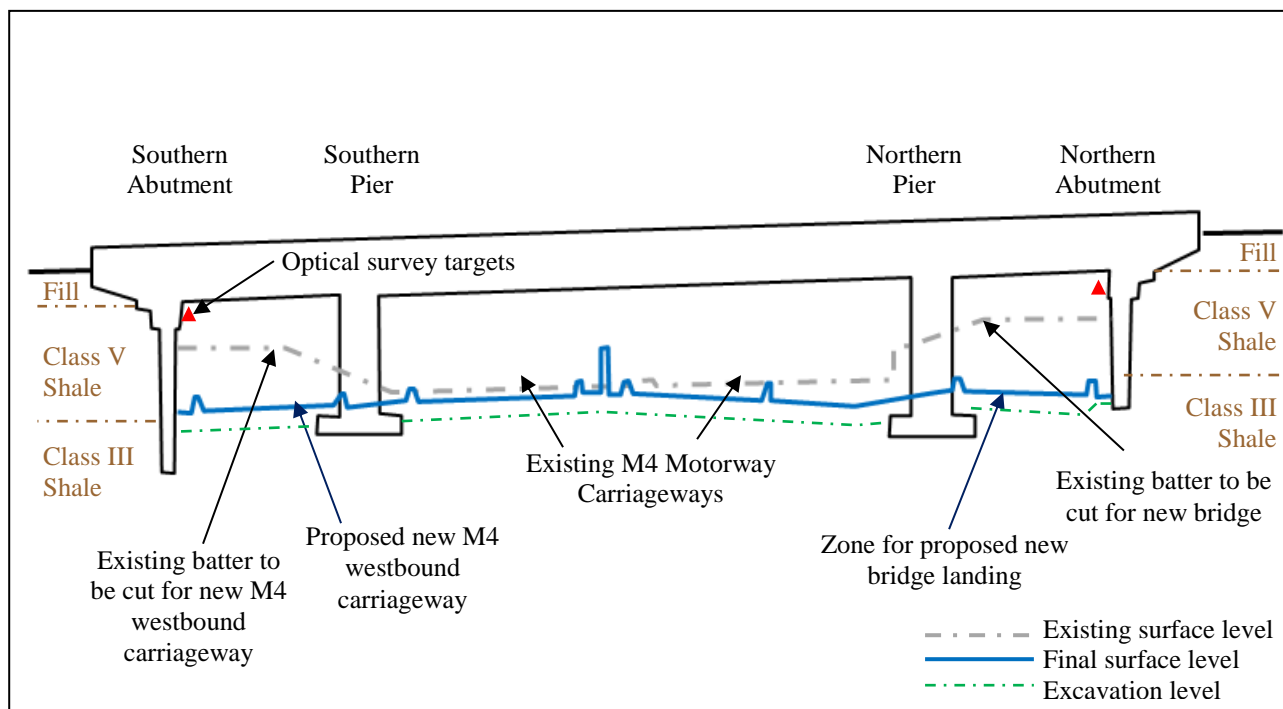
Sketch of elevation of existing and final surface level under the existing Concord Road Bridge.
